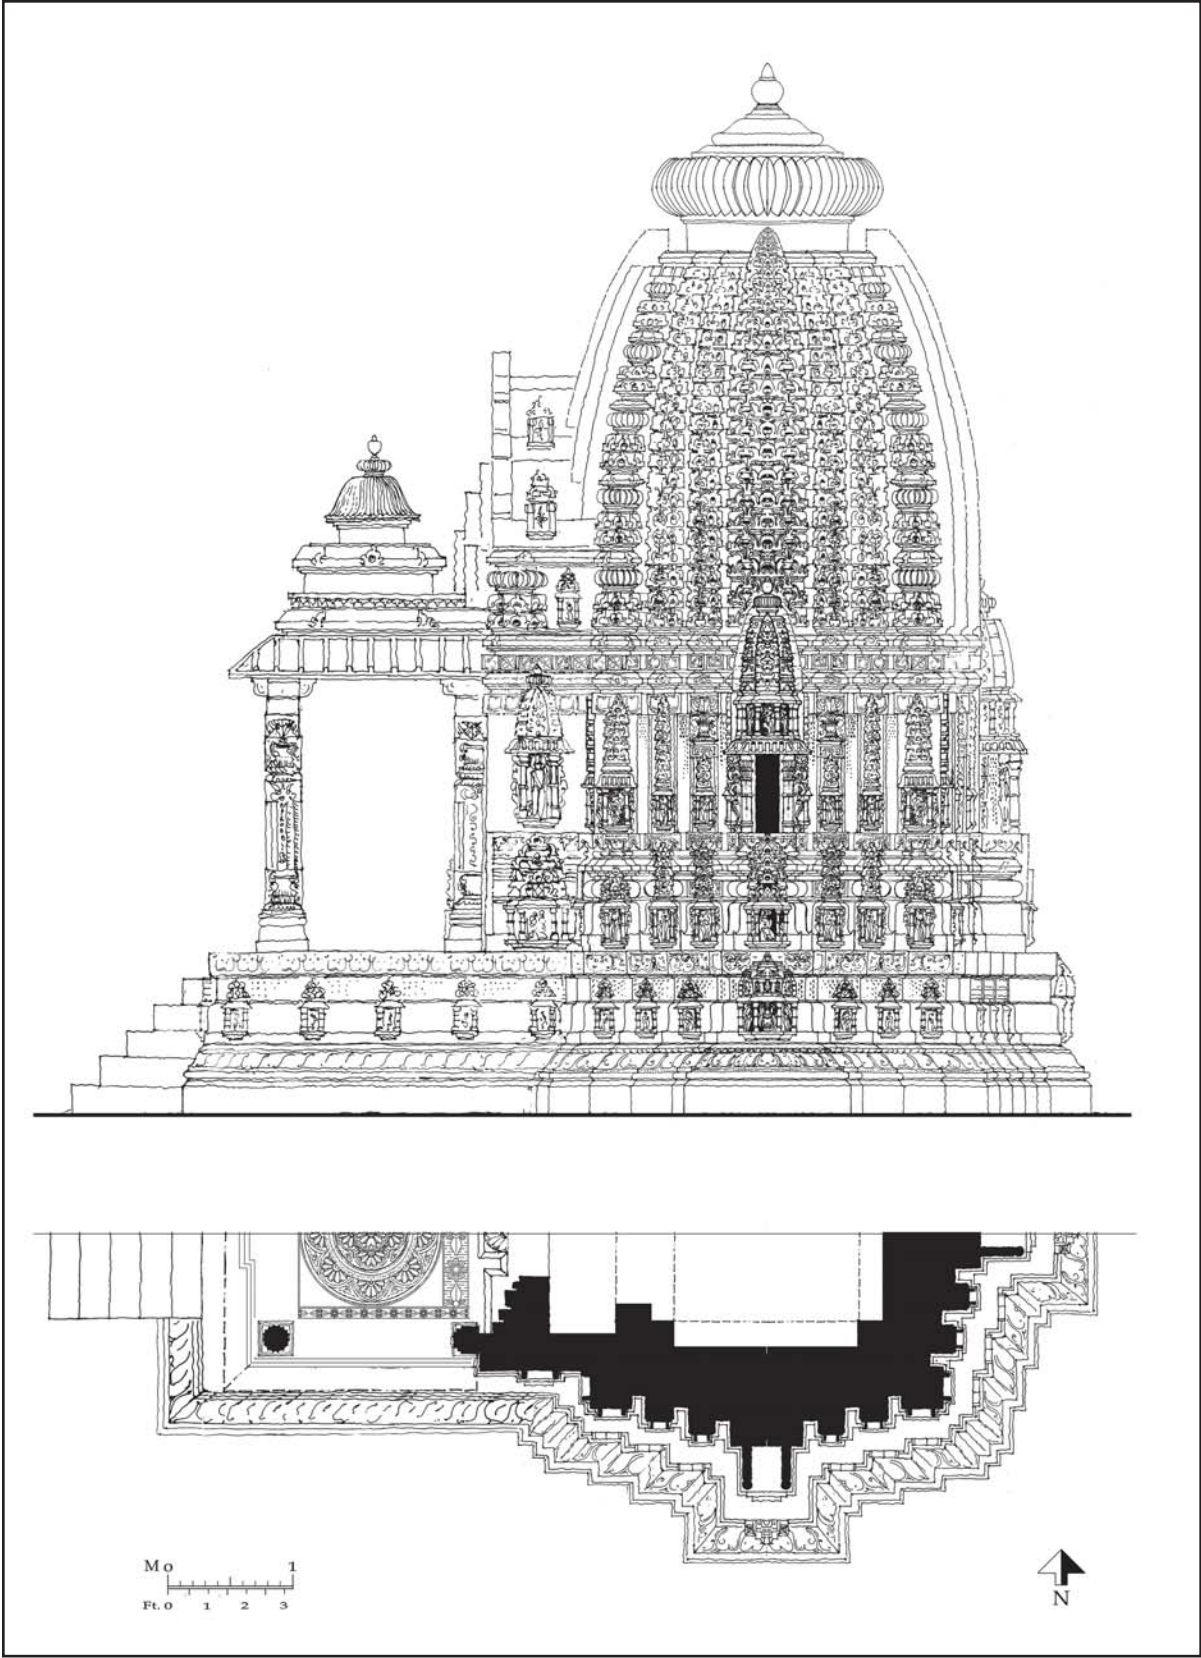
Temple 5, reconstructed plan and south elevation.
